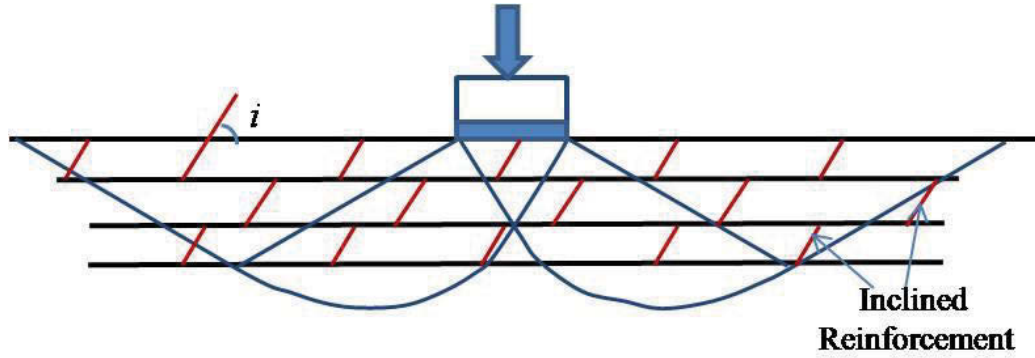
Failure mode within reinforced zone of soil foundation
